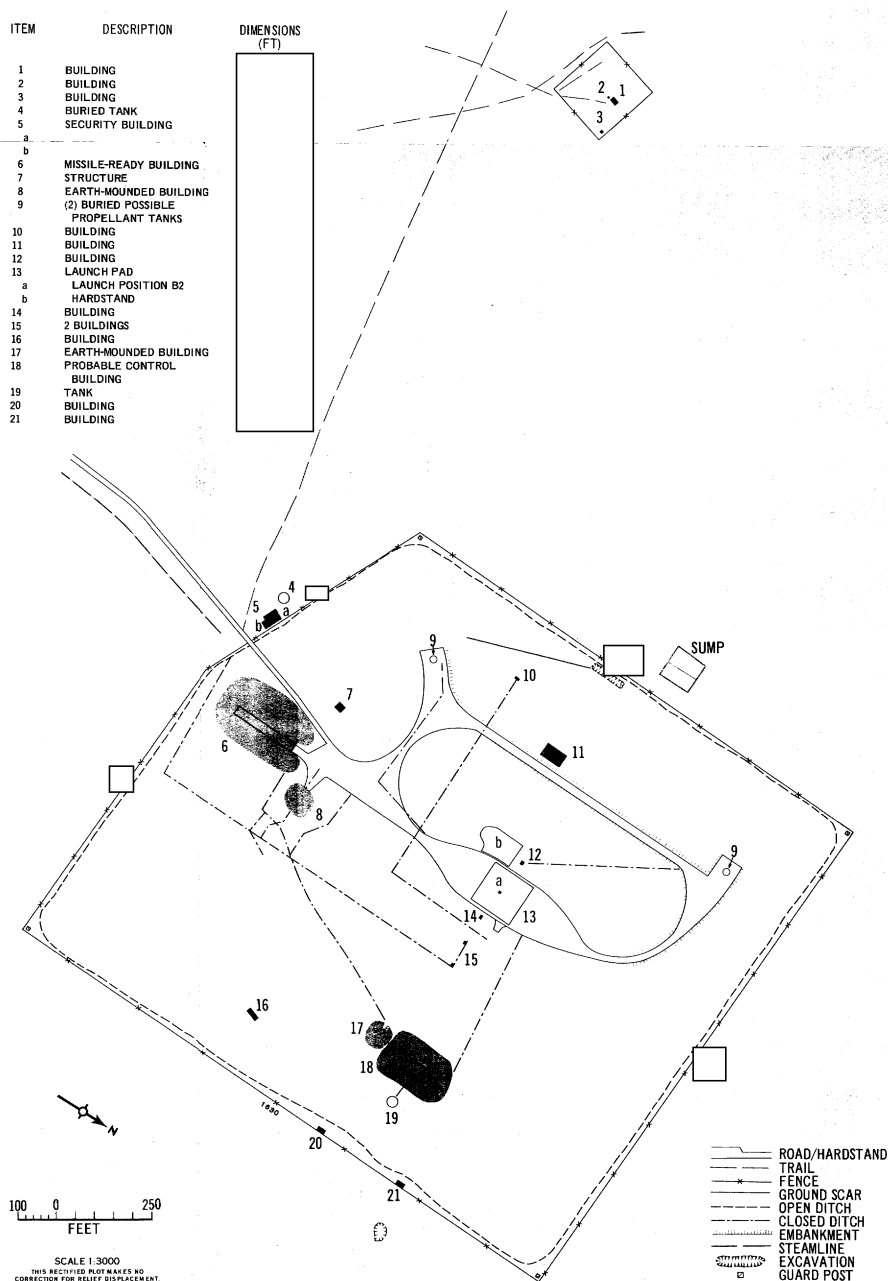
LAYOUT OF LAUNCH SITE B2, LAUNCH COMPLEX B, TTMC.
